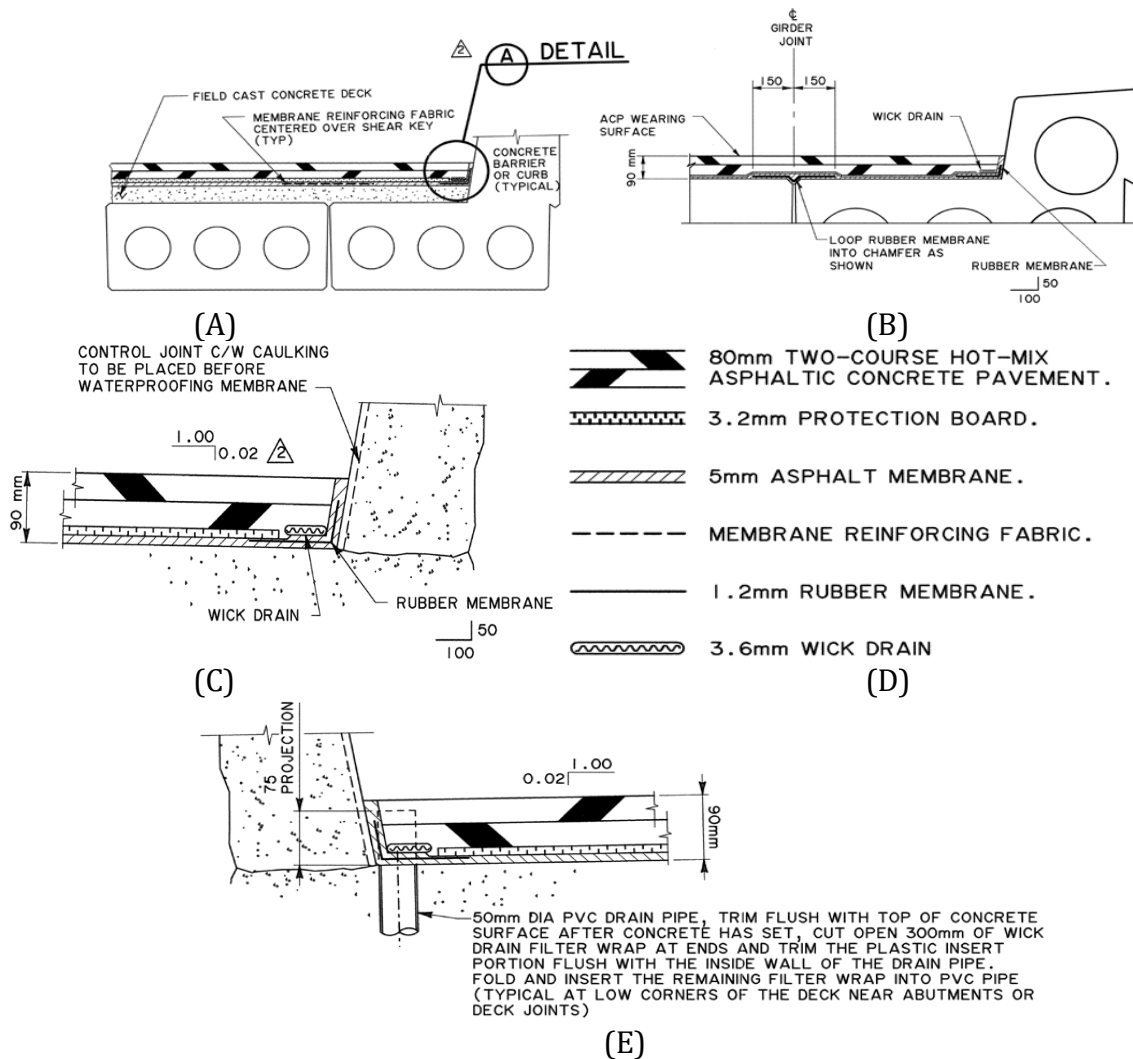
Examples of Provided in Standard Drawings (A) Composite Deck, (B) Non-Composite Deck, (C) Detail of Composite Deck, (D) Legend, (E) Drain Pipe Detail (Russell H. G., 2011).
